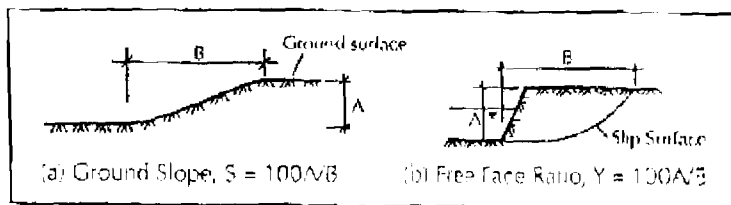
Elevation View Showing Ground Slope and Free Face Ratio
